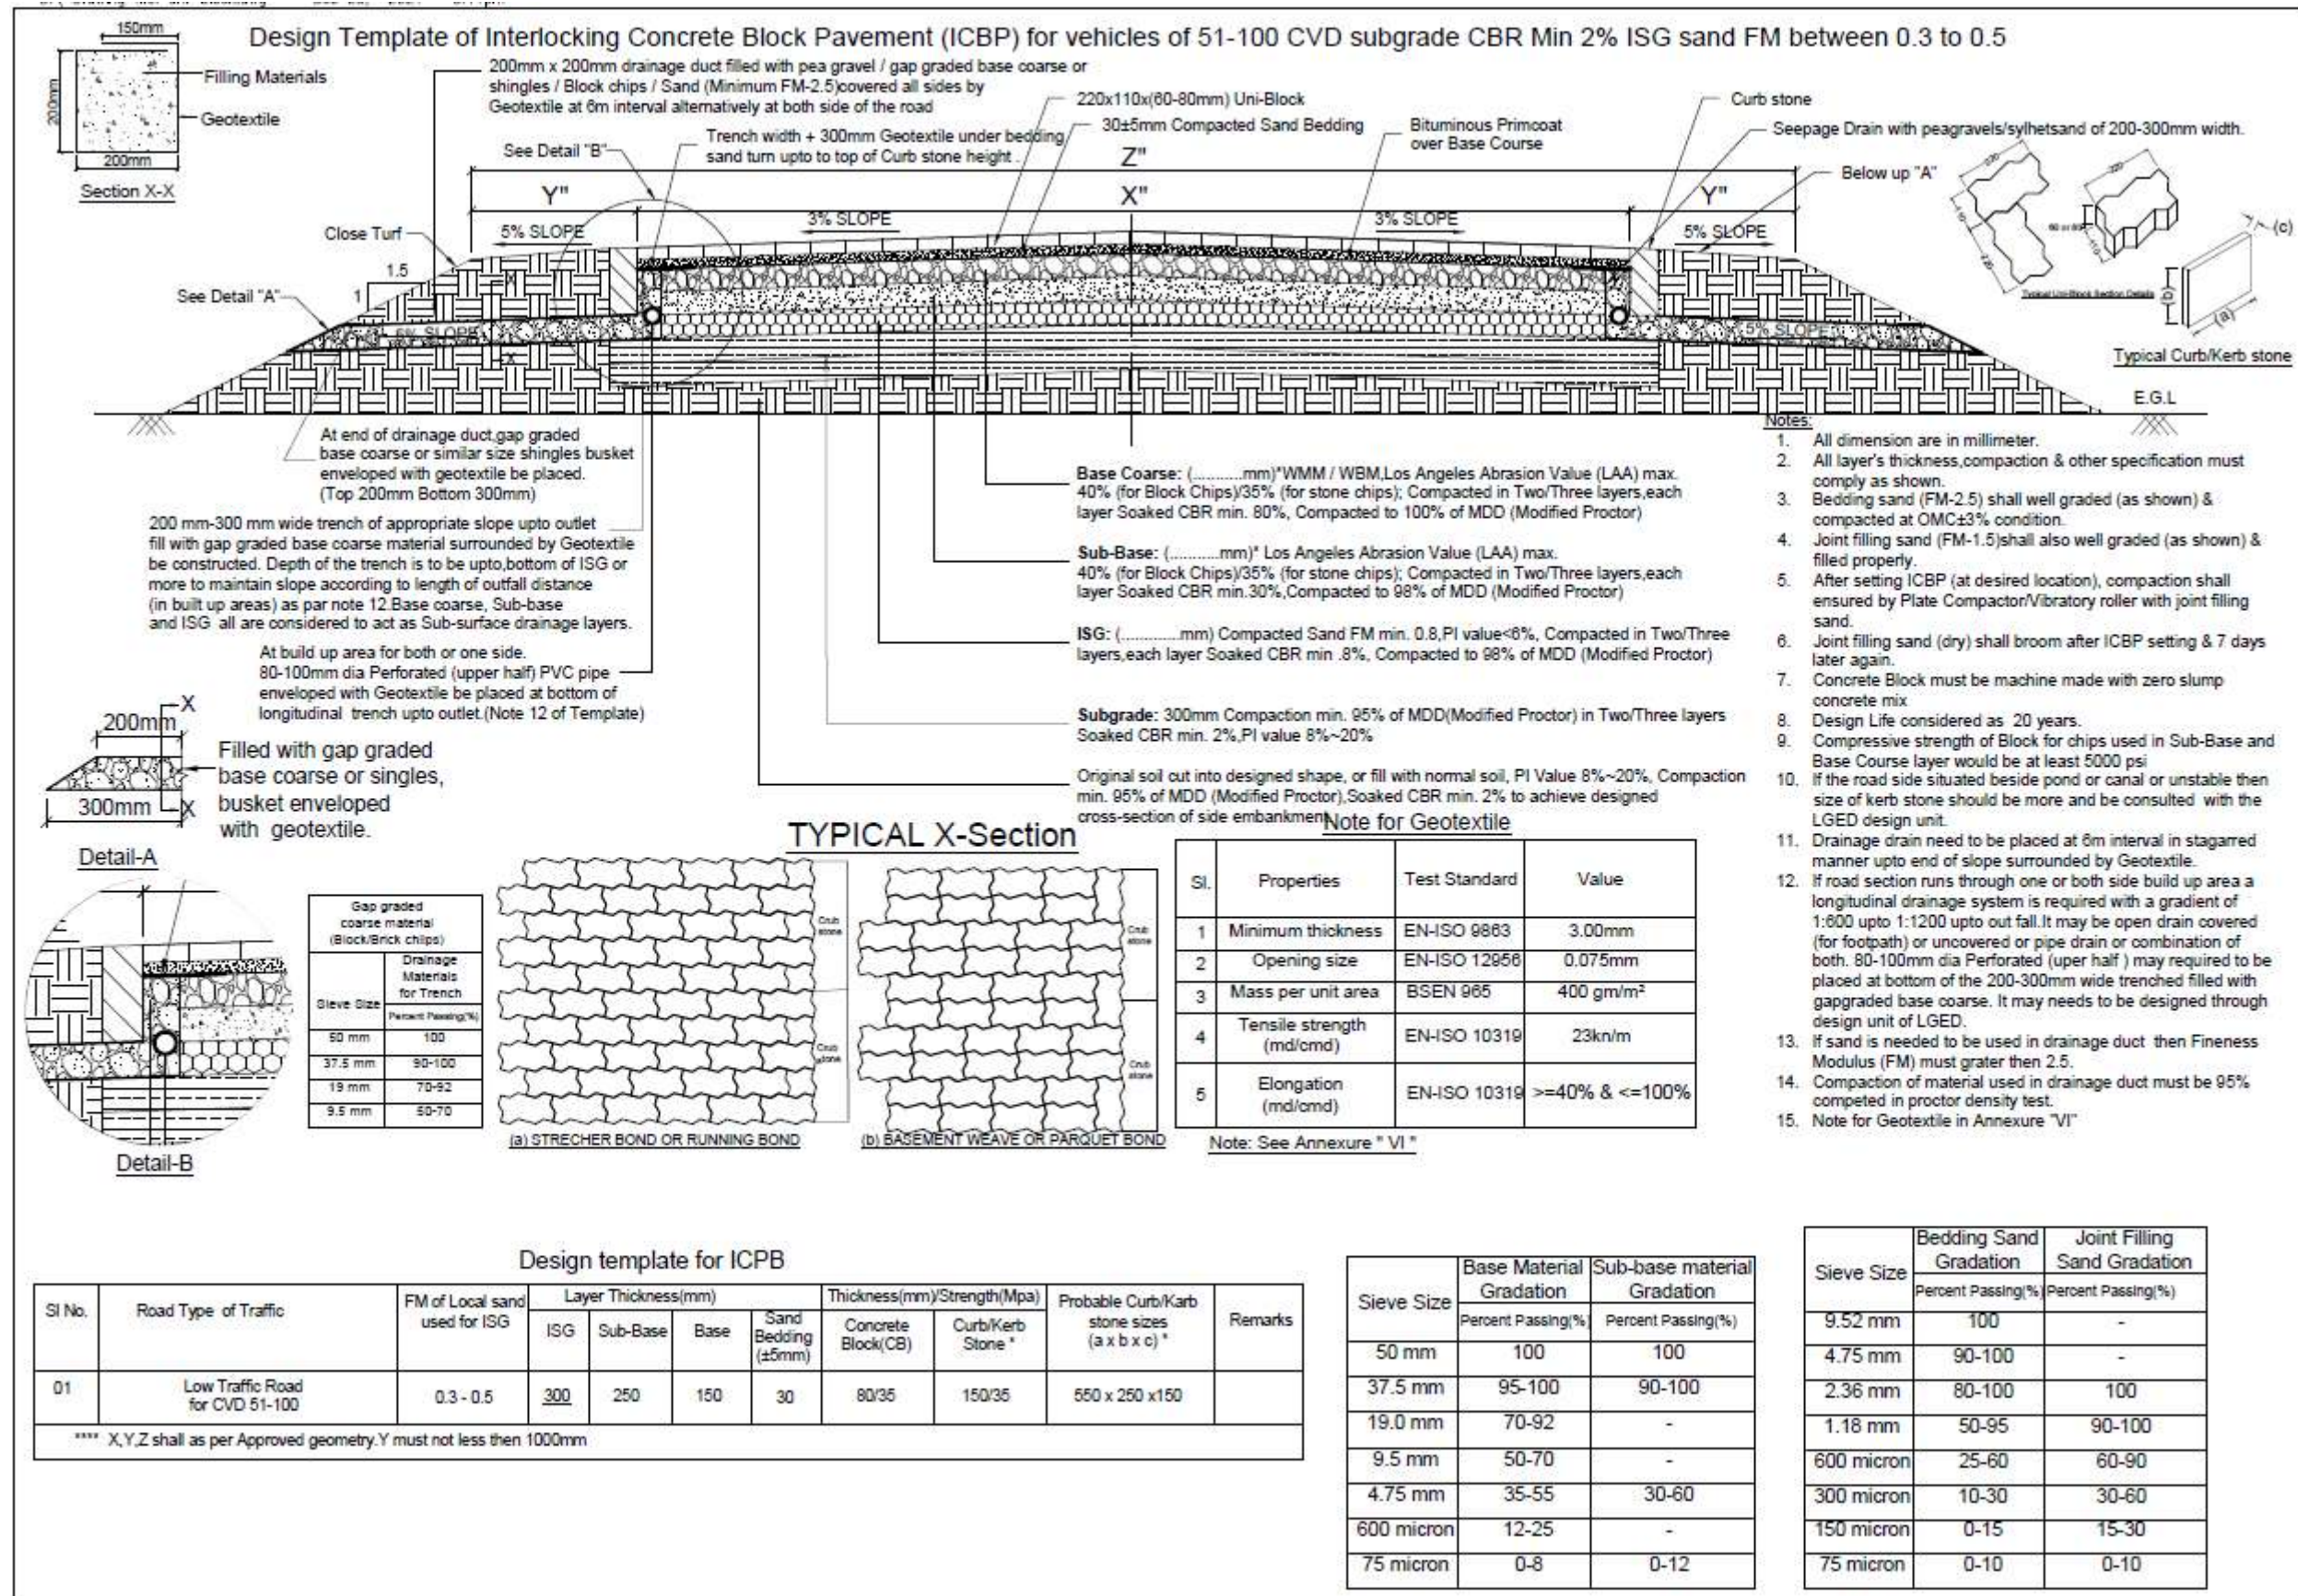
Design Template of Interlocking Concrete Block Pavement (ICBP) for vehicles of 51-100 CVD subgrade CBR minimum 2% ISG sand FM between 0.3 to 0.5
